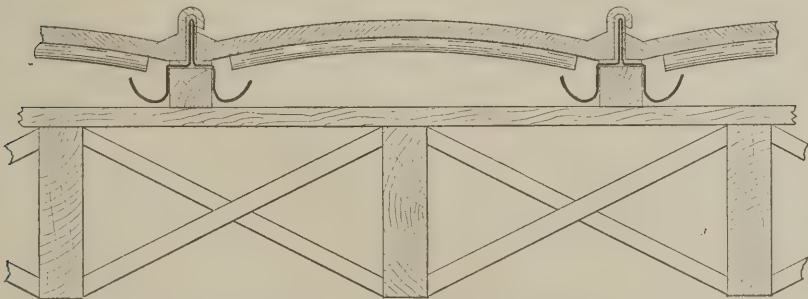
Section Showing the Cooper Tile Roofing as Constructed with Lap Joints.
